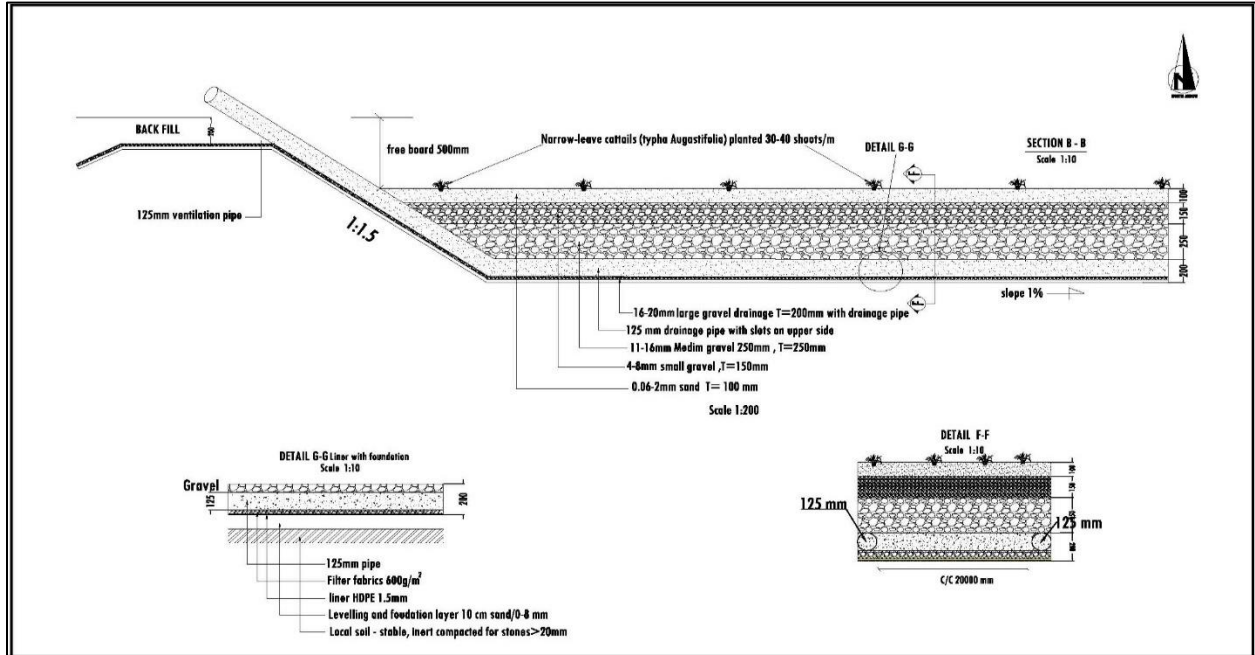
Cross section of septage pond treatment facility at Kep SLF
